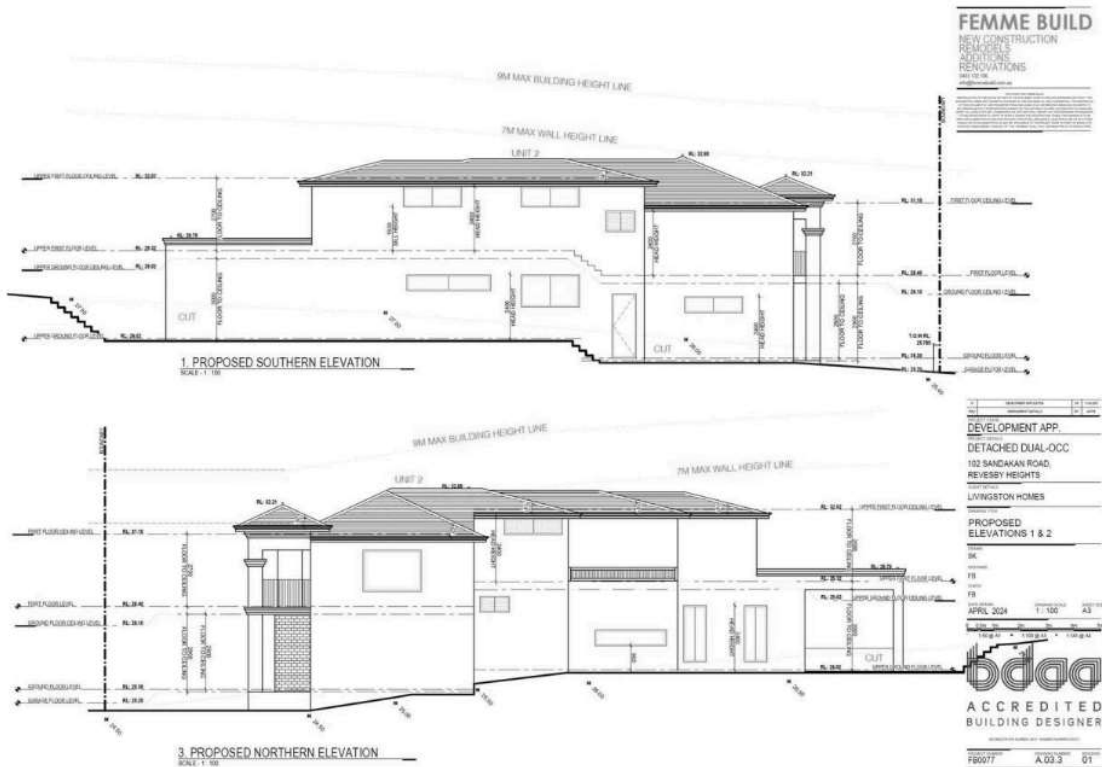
Proposed Southern & Northern Elevation (Source: Femme Build)
